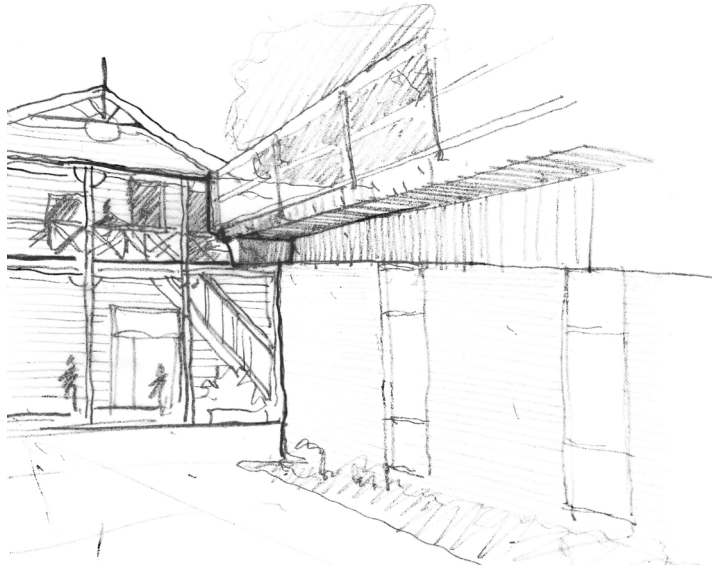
Current perspective view looking from the west towards the White House & existing University Hall
